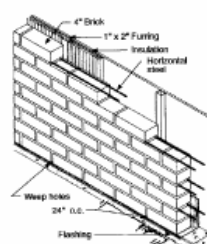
Isometric of 4-in. reinforced brick curtain wall with furring, insulation and interior finish.
